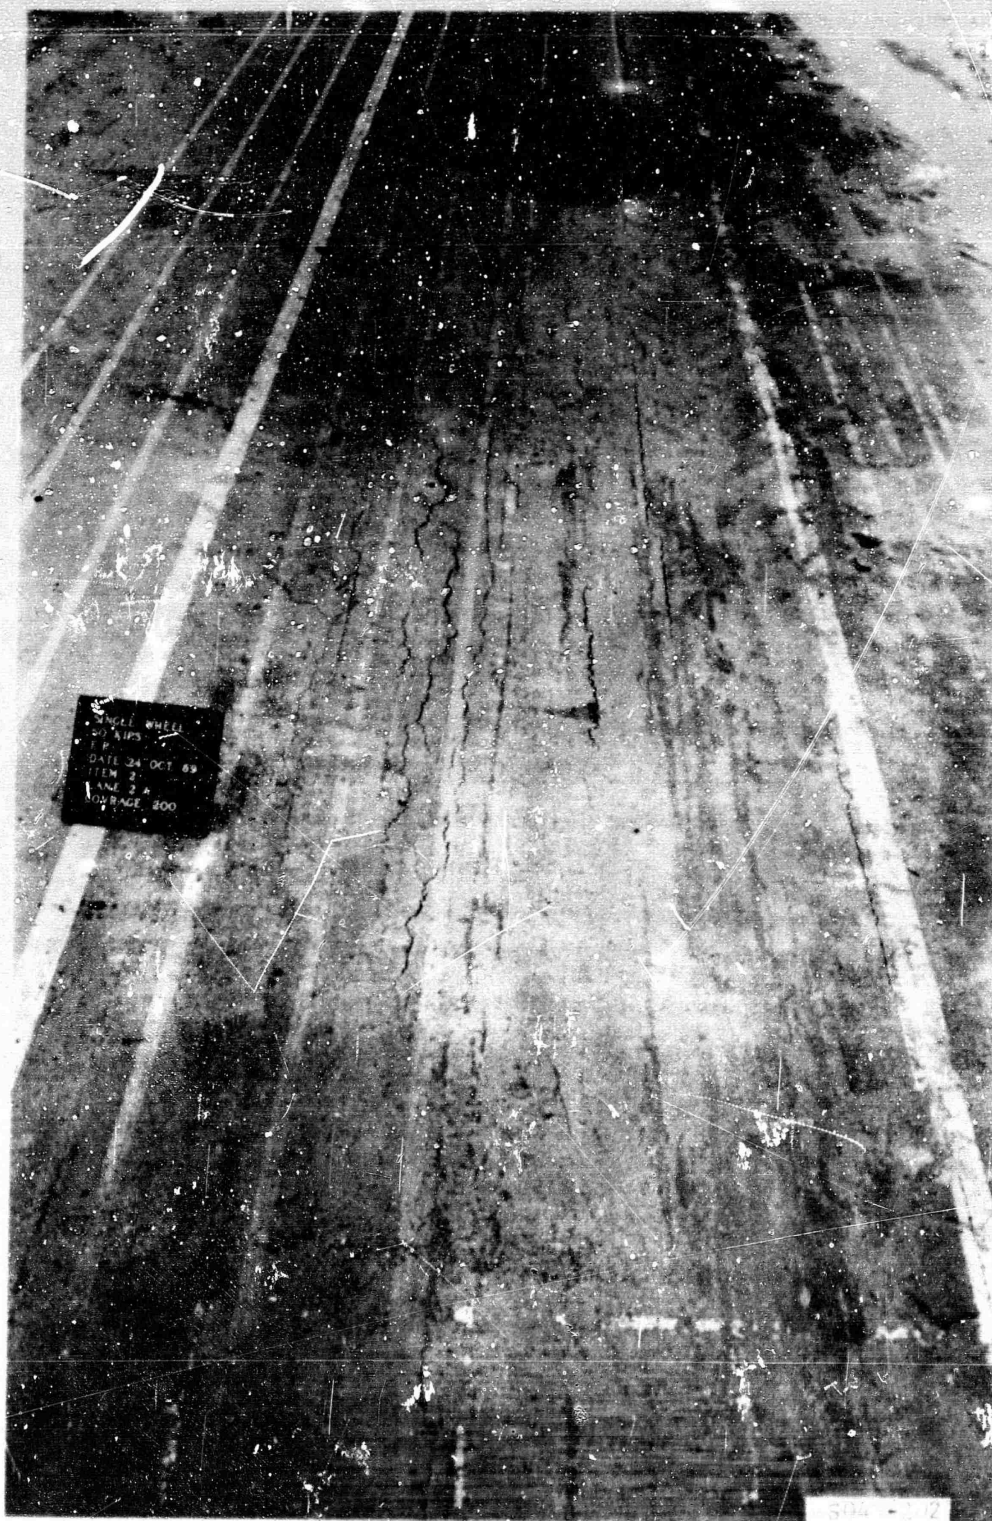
Failure of Flexible Pavement in Item 2, Lane 2A, Caused by Subgrade Shear Deformation
